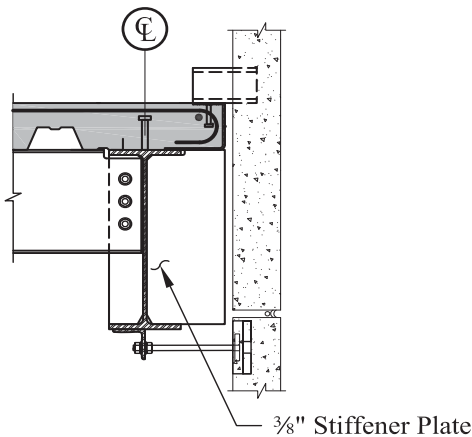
Section of spandrel beam with stiffener plate at bottom flange connection to precast panel.
